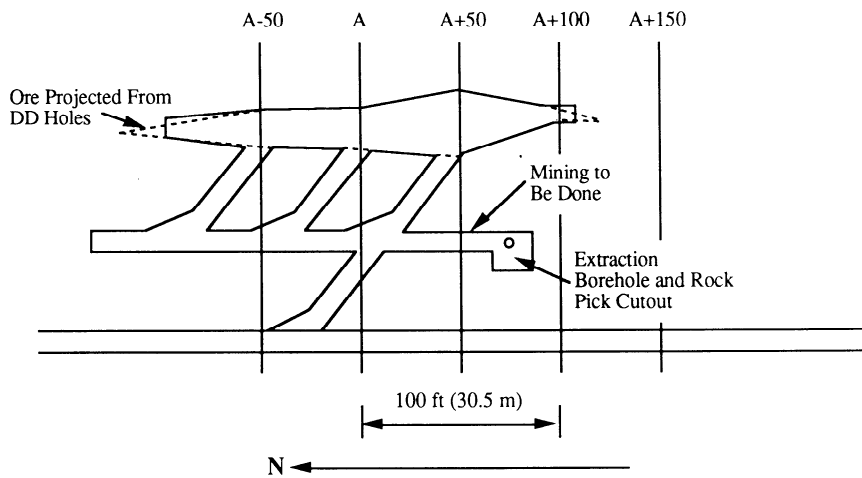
Bottom sill layout on projected ore with mining to be done for scrams and borehole dump.
